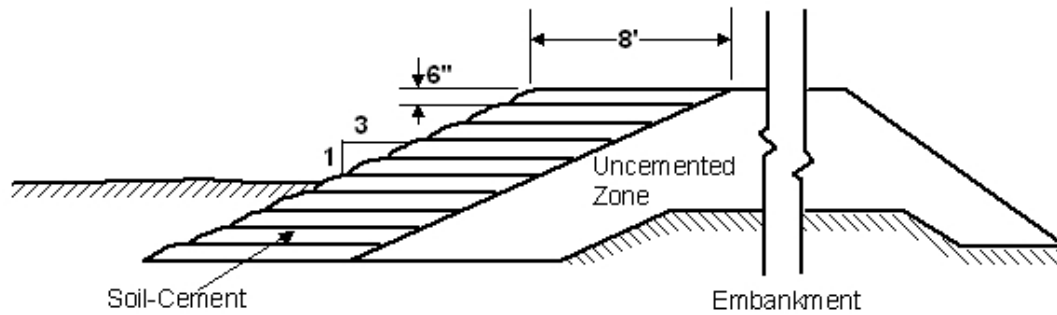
Typical soil-cement bank protection (after [Richardson and Davis, 2001](#)).
